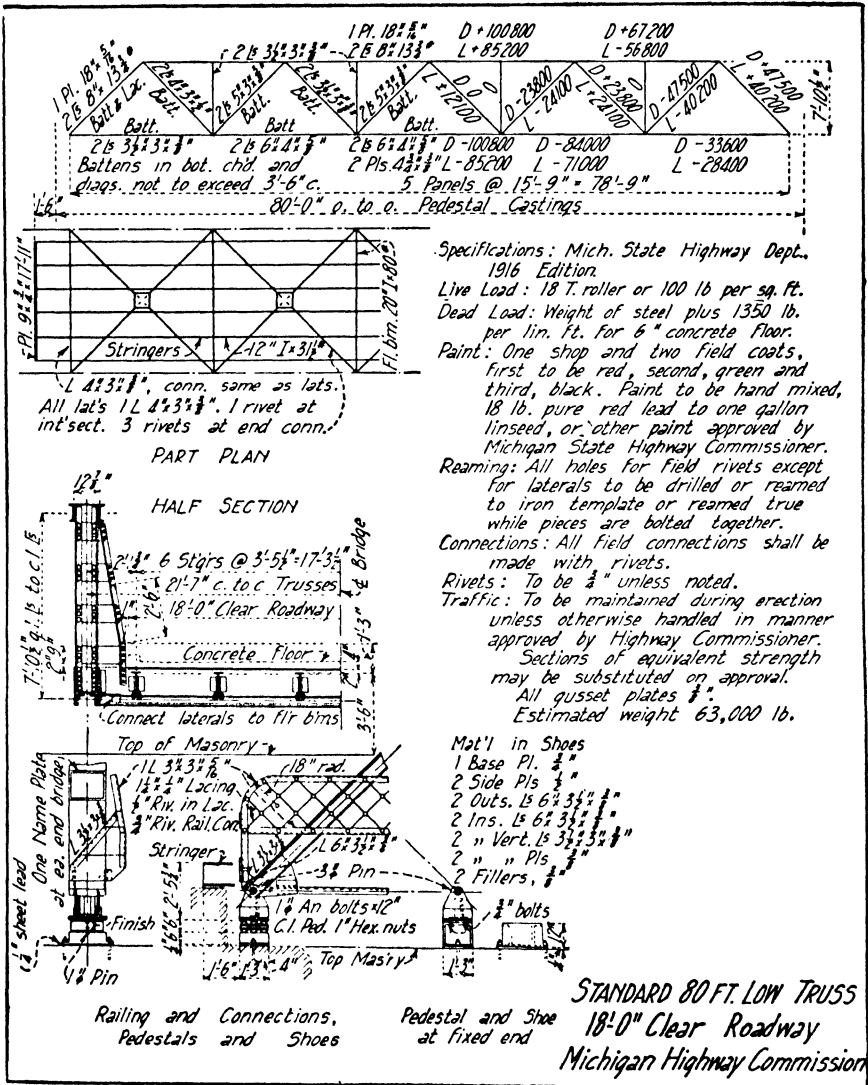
LOW TRUSS SPAN WITH STRINGERS.
